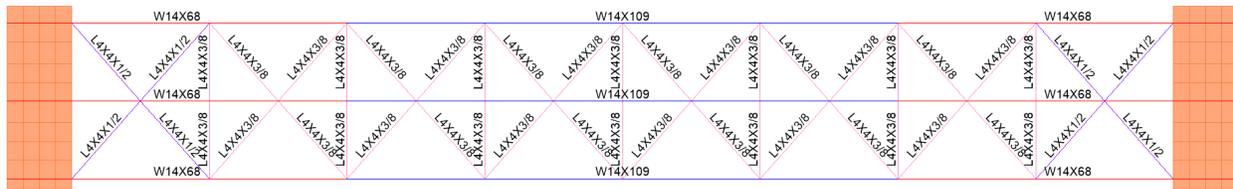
Elevation View of Downstream (Basin) Side Framing
